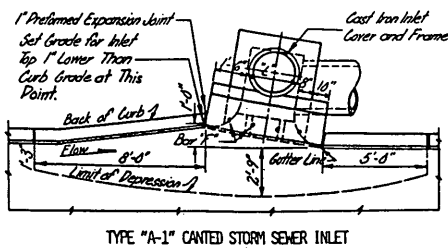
Plan view of city of Lincoln canted curb-opening inlet (flow from left to right).
